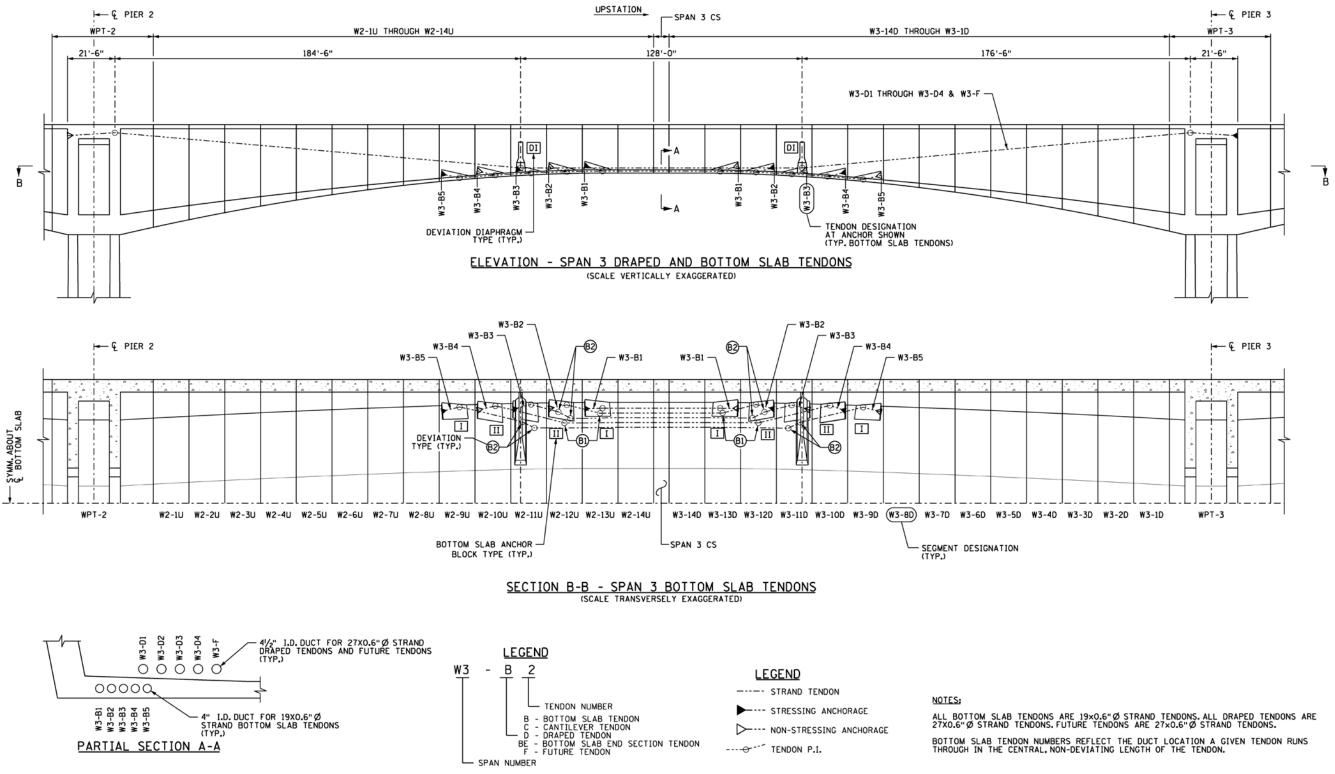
Westbound Span 3 Draped and Bottom Slab Post-Tensioning Layout
